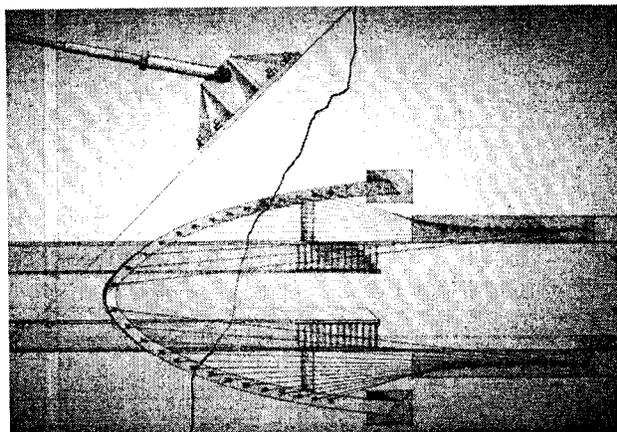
Bridge Design Drawing. Andy Schneggenburger.
